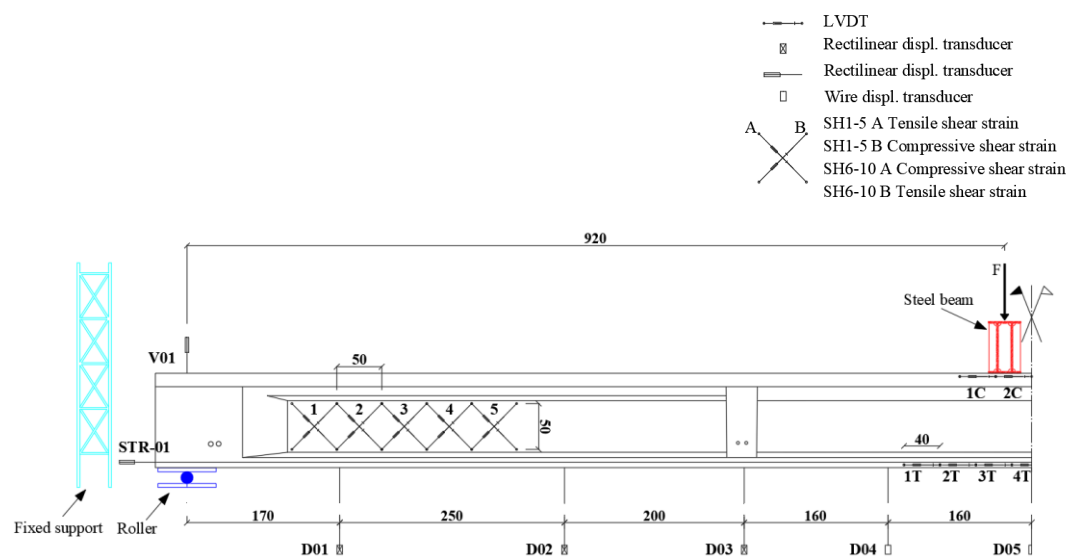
Test setup and layout of the monitoring system installed on B3-P47/46 girder (unit: cm).
